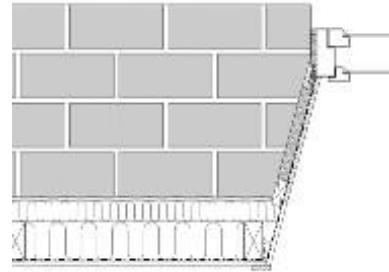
Horizontal section of the joint between the loadbearing exterior wall and the window after improved thermal insulation measures.
